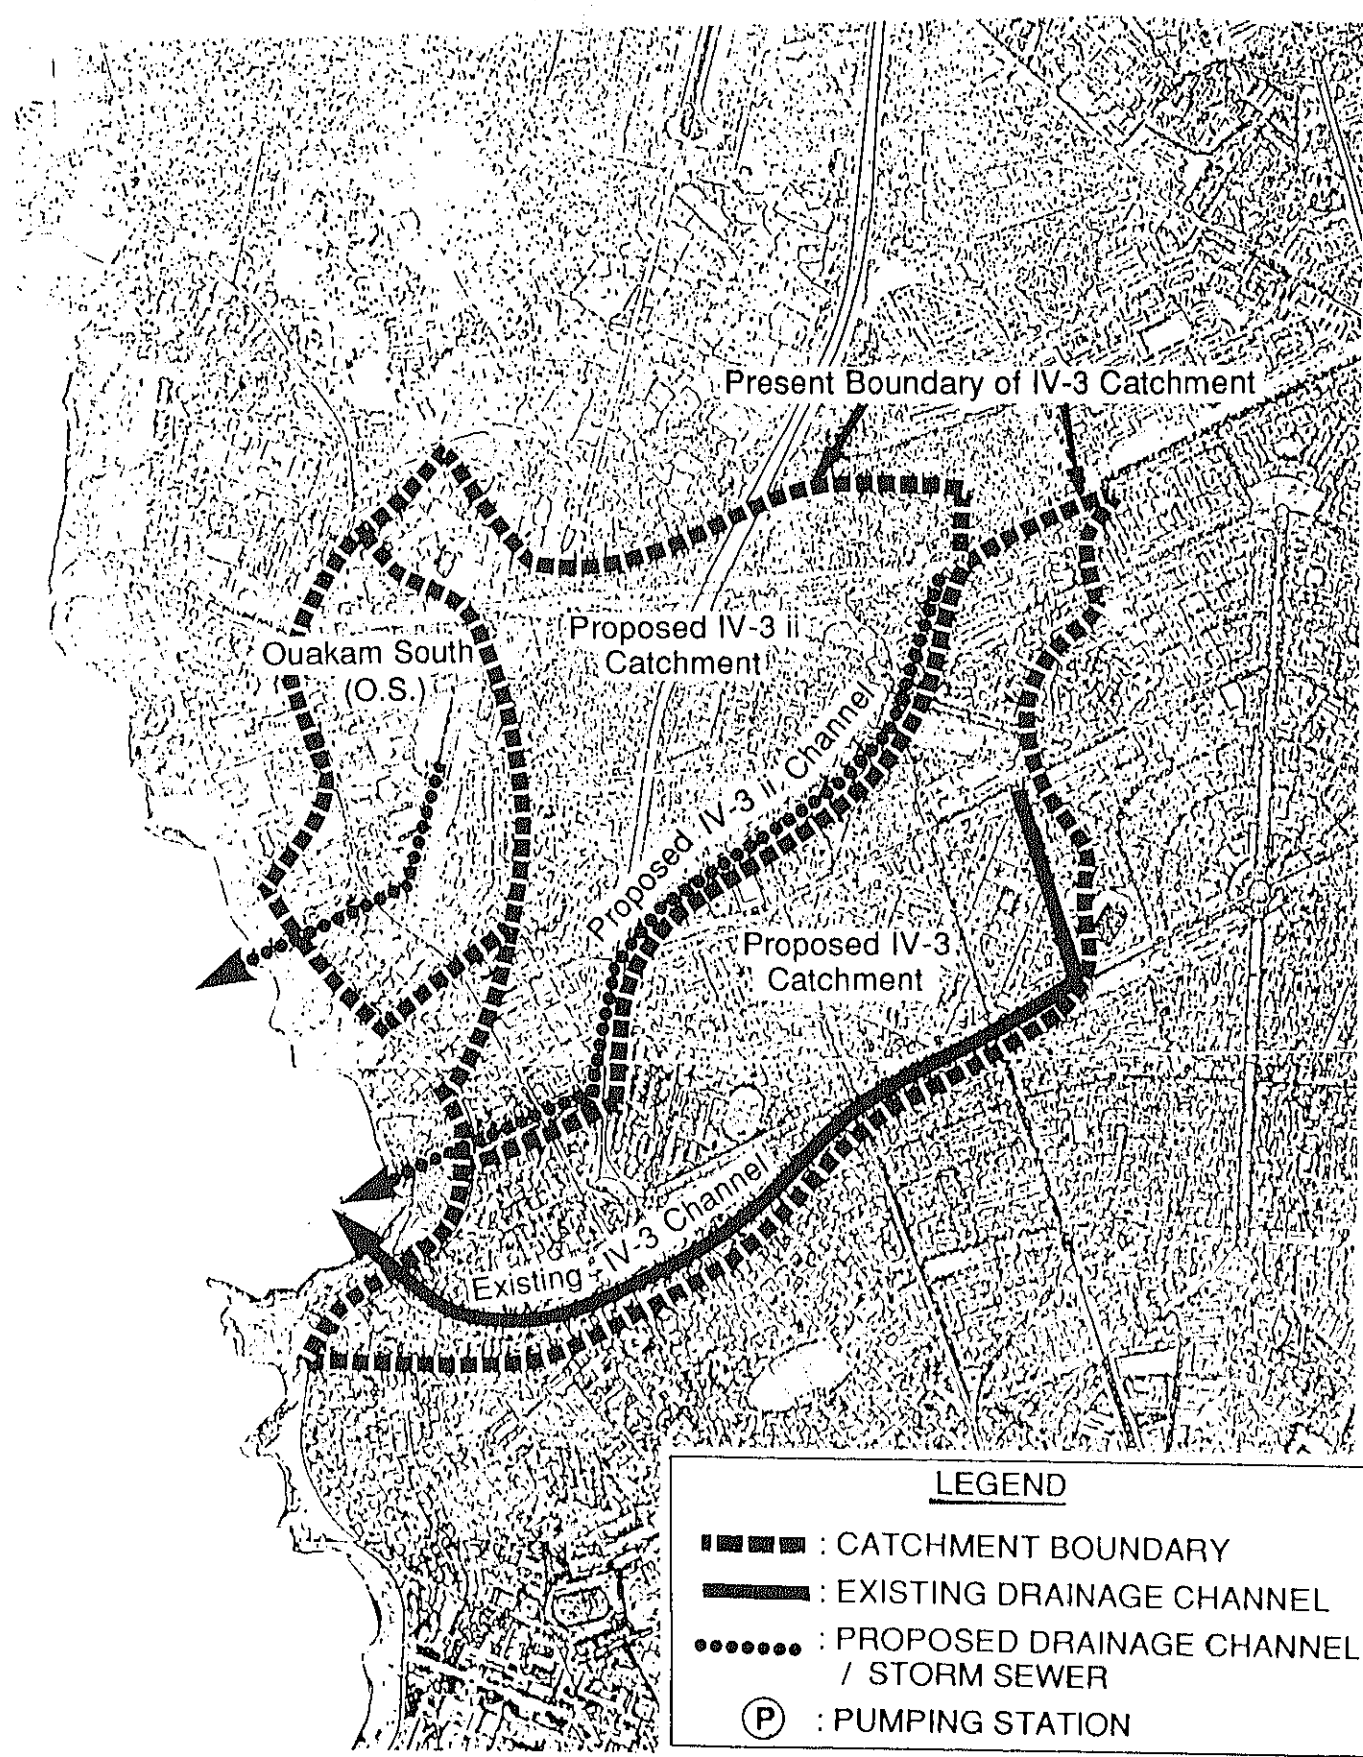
PROPOSED DRAINAGE IMPROVEMENT PLAN
